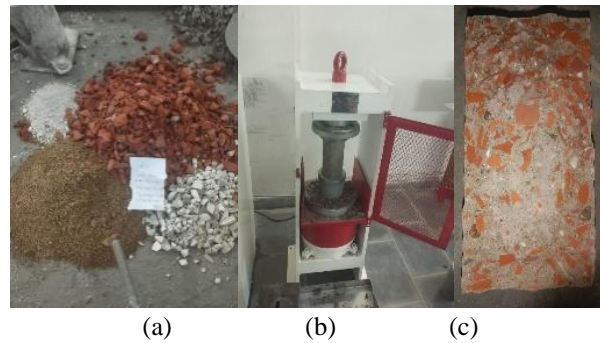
(a) Aggregates, (b) Compression test setup, (c) failure surface after loading
